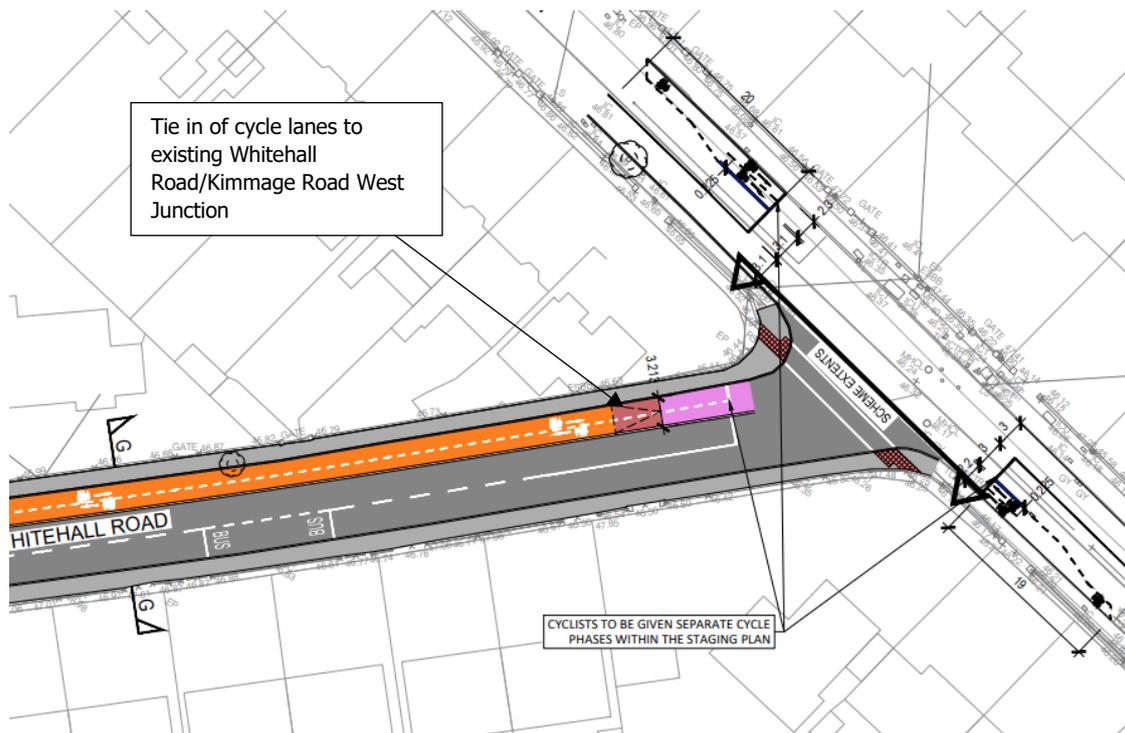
Proposals at the Whitehall Road/Kimmage Road West Junction
